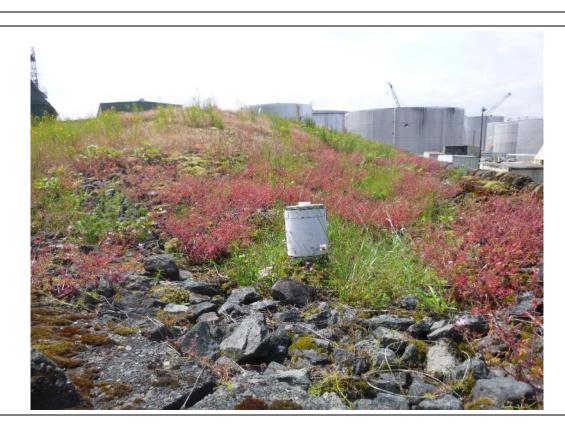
View of the northwest corner containment cell cap with a vent pipe (facing southeast)
